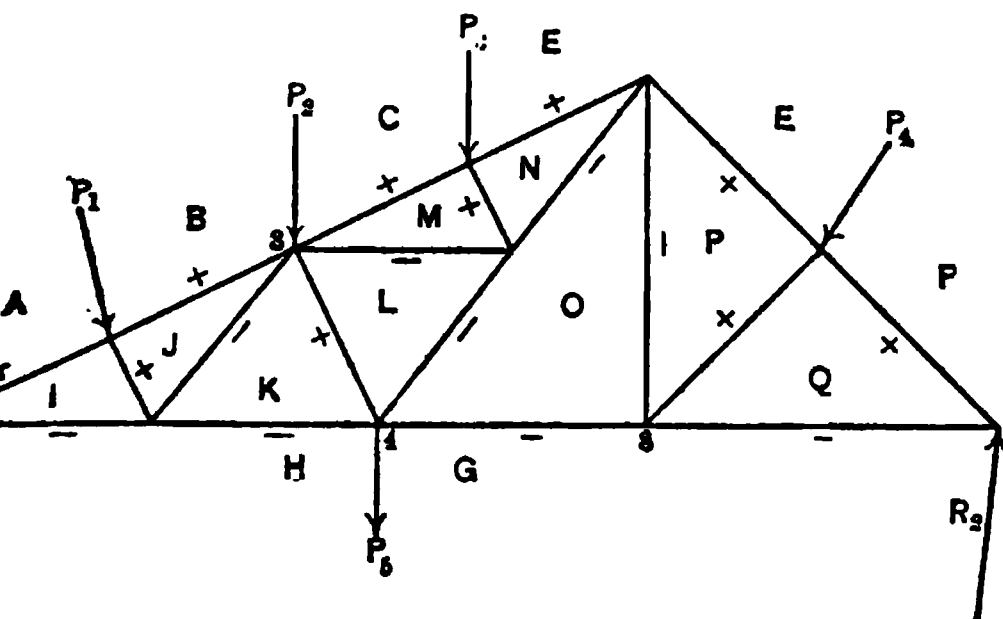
Unsymmetrical Truss. Truss-diagram
